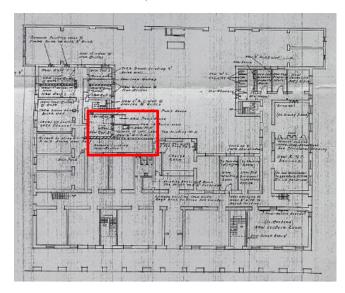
1956 plan showing fill up of outdoor alcove space [ArchSD]
